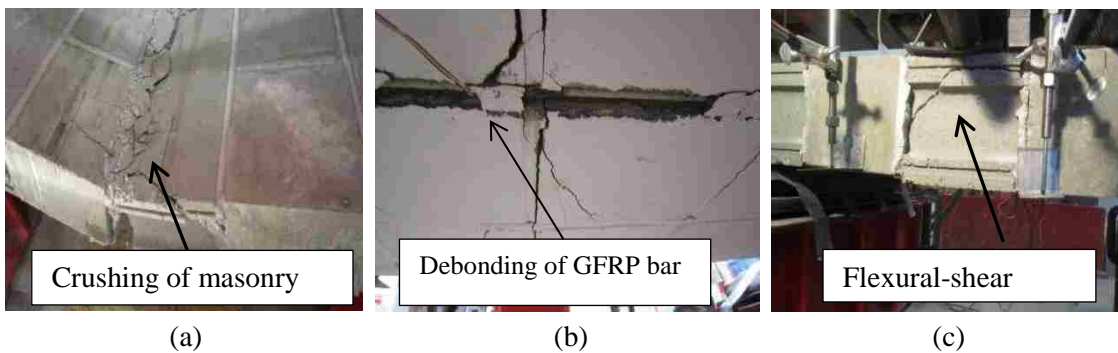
Observed modes of failure: (a) flexural failure, (b) debonding of FRP bar, (c) flexural-shear failure
